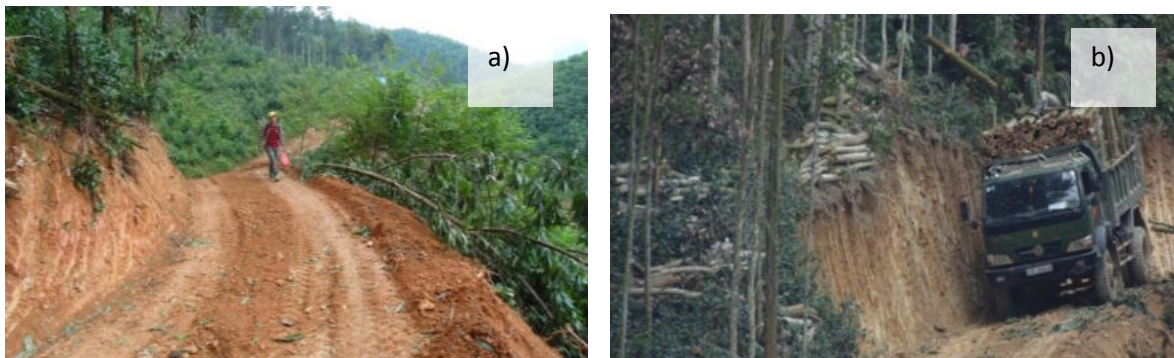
New roads were built to be accessible to timber delivered (a, b)
